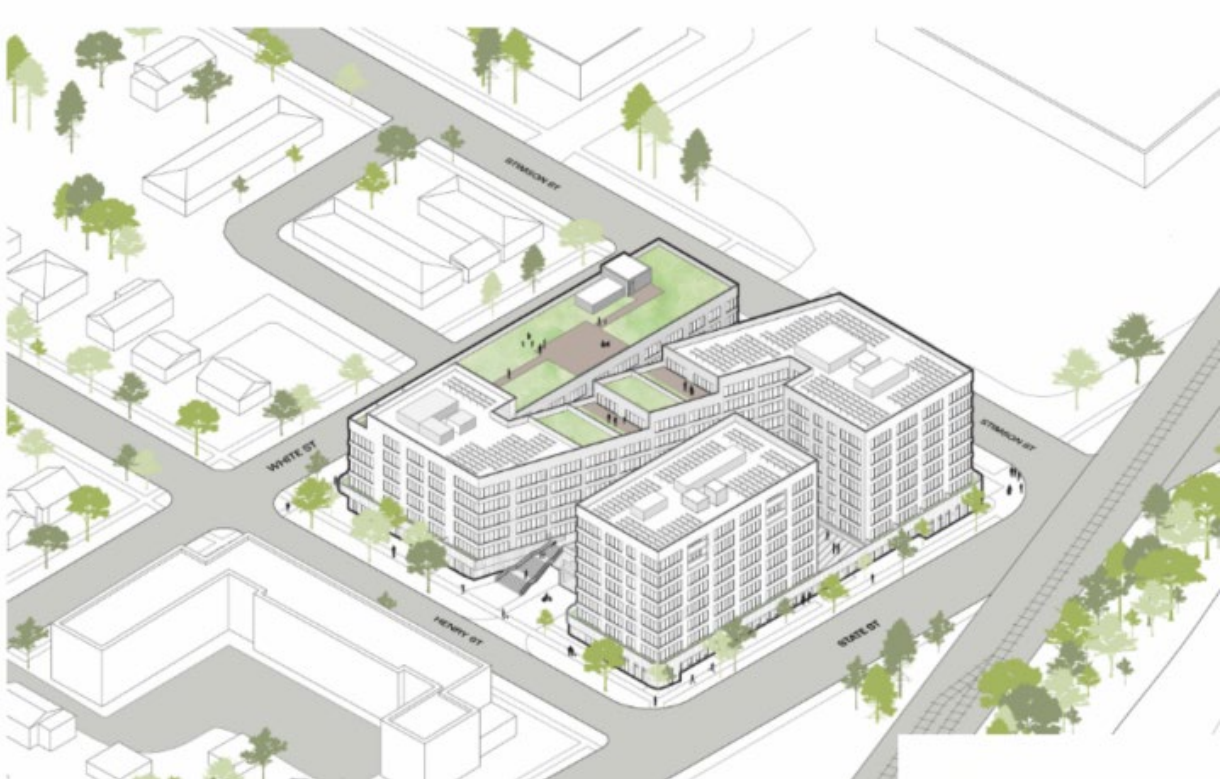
Axonometric Site Layout (Henry/South State corner looking SE)
